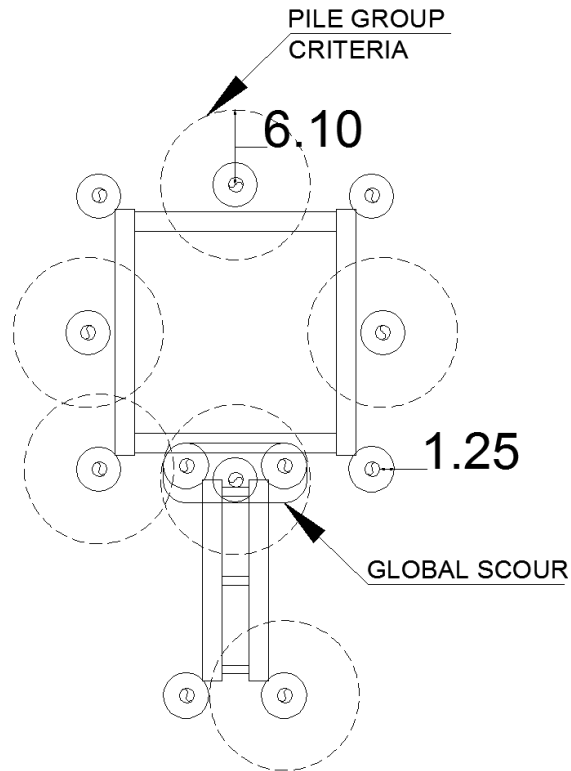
Anchor Bent Adjacent to Expansion Loop Pile Projection (dimensions in meters)
